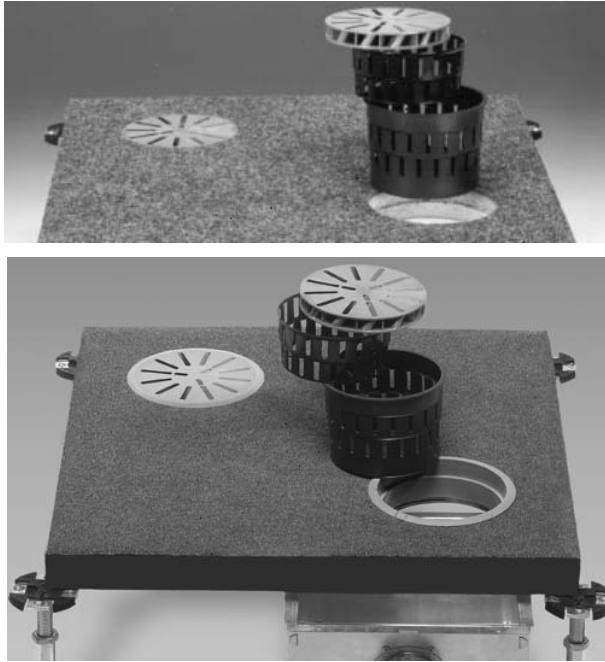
Floor twist outlet DB-E-DN 150 with VSD-type distributor basket; example for installation in floor tiles; above: with stepped bore, below: with clamp insert and connection box
